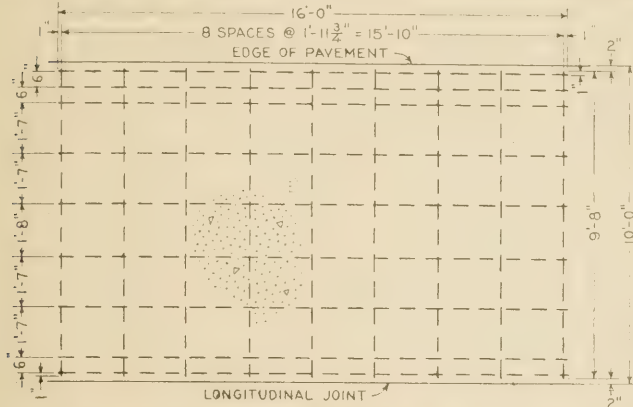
TYPICAL BAR MAT FOR REINFORCED PAVEMENT; BARS 1/4 TO 1/2 INCH ROUND, WELDED, CLIPPED, OR WIRED AT ALL POINTS OF INTERSECTION; MATS LAPPED 12 TO 14 INCHES
